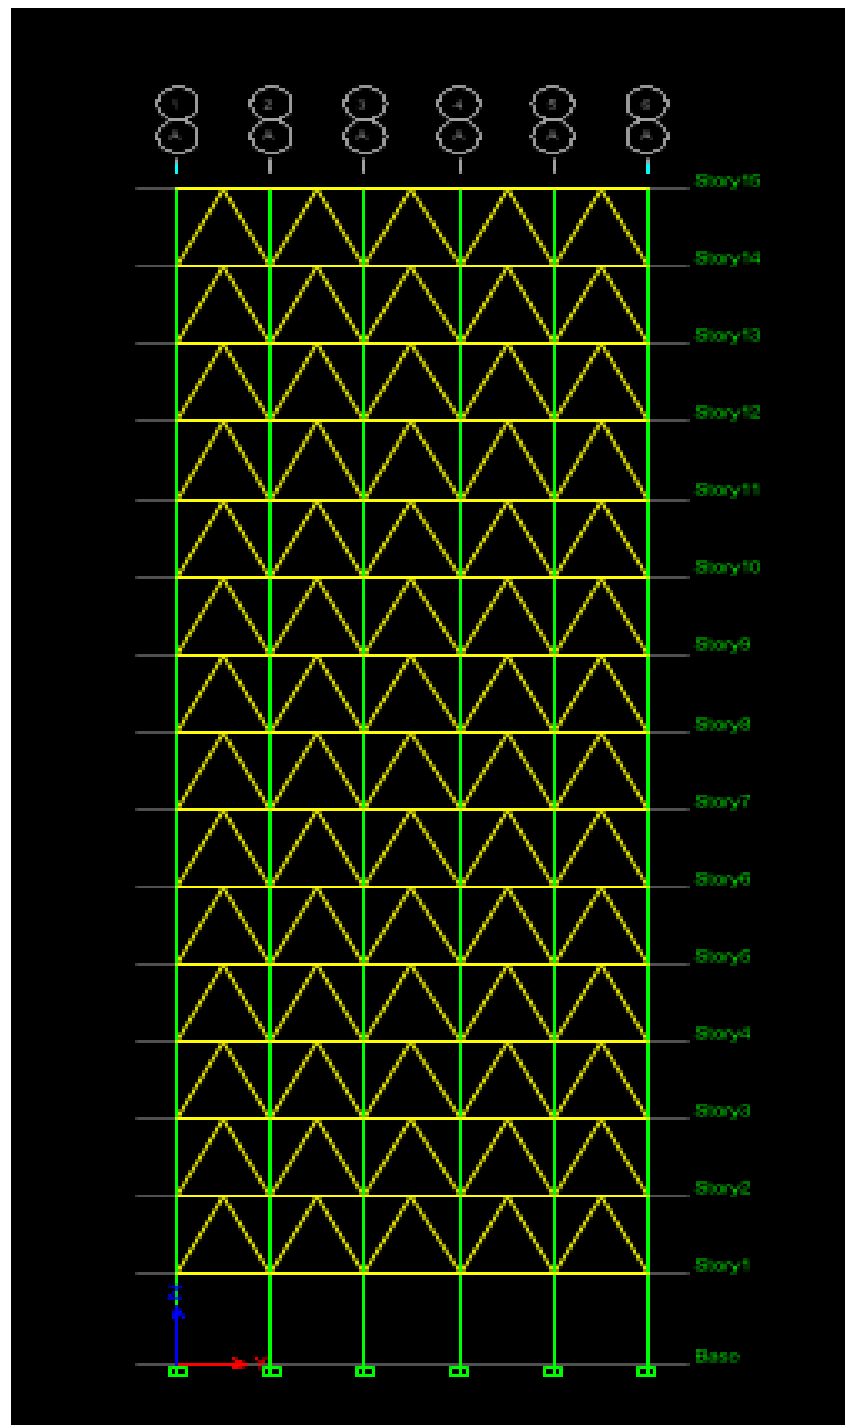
Elevation View of Building With Inverted V-Bracing
